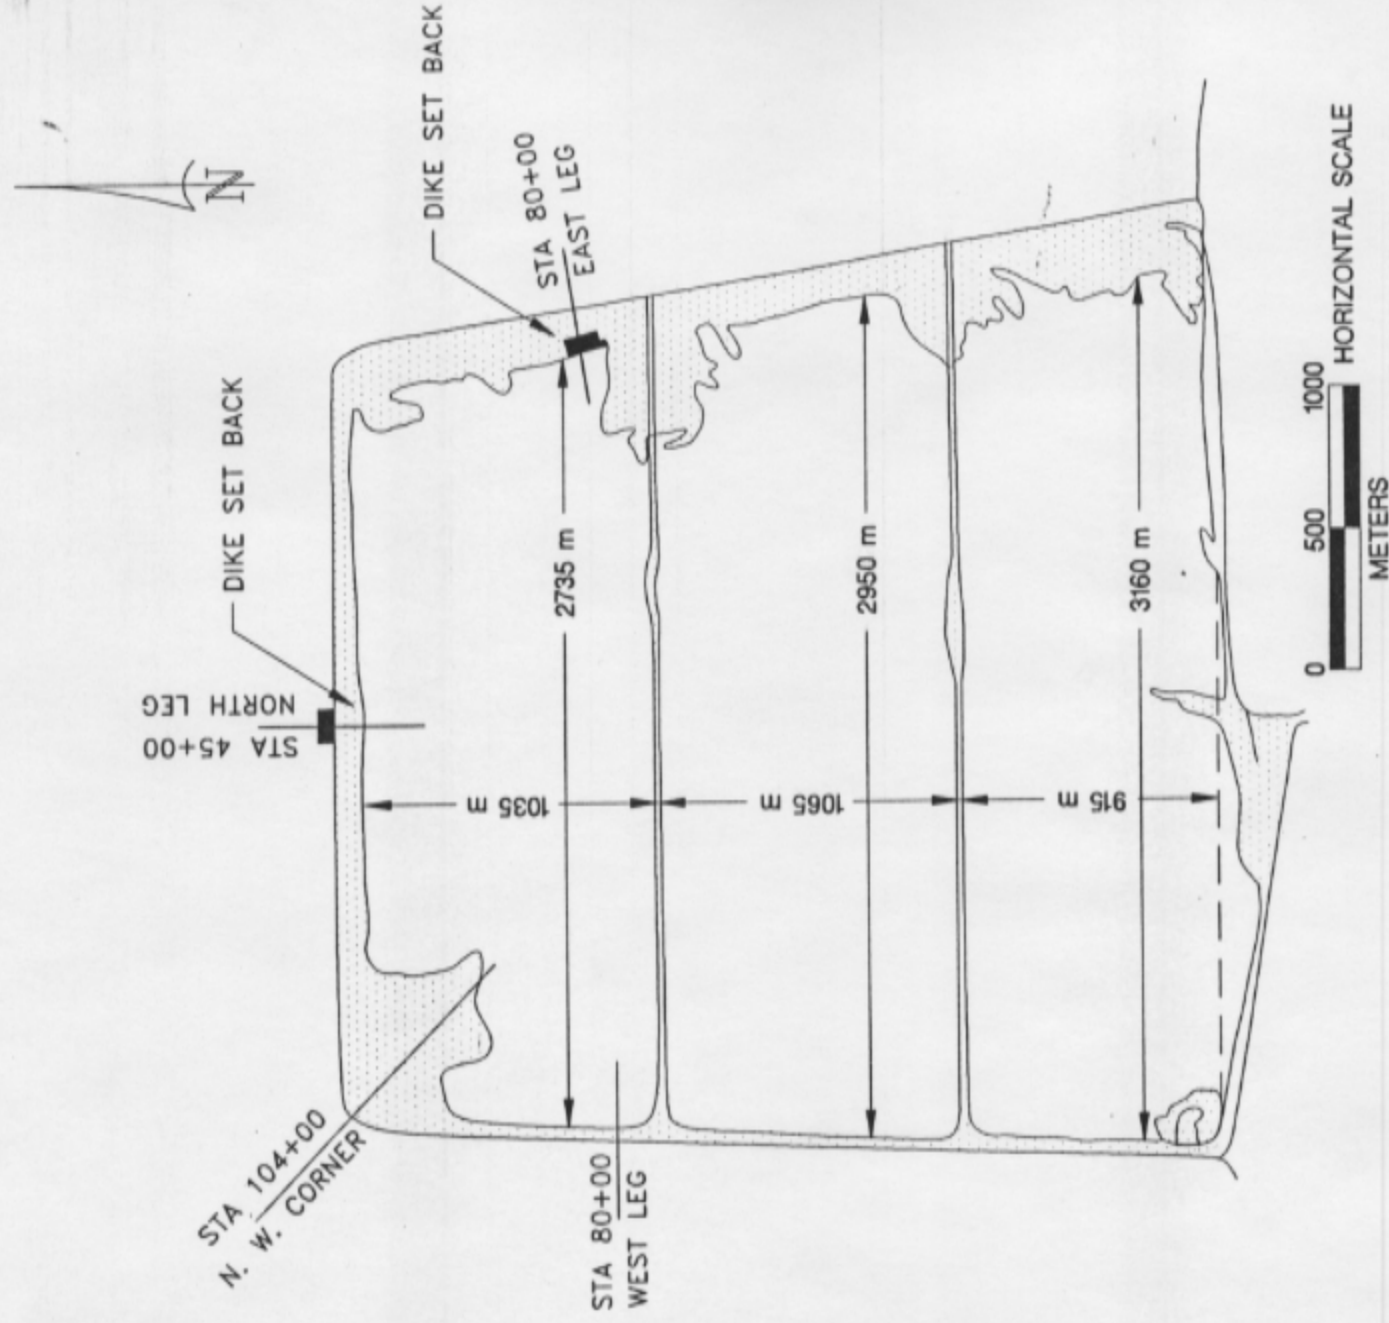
Plan View of Craney Island and Location of Dike Cross Section
